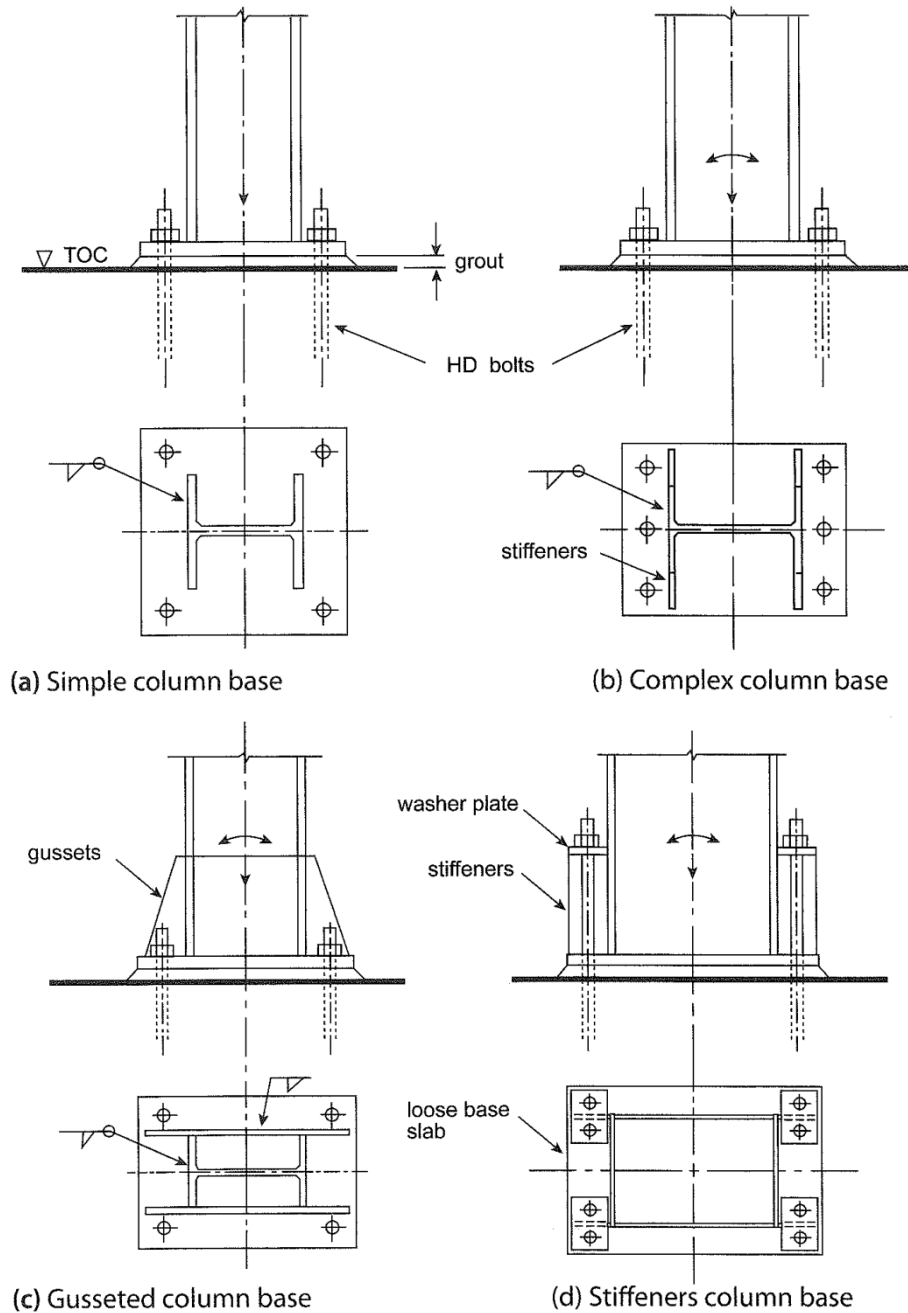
Column bases fixed down to the concrete foundation by means of HD bolts
